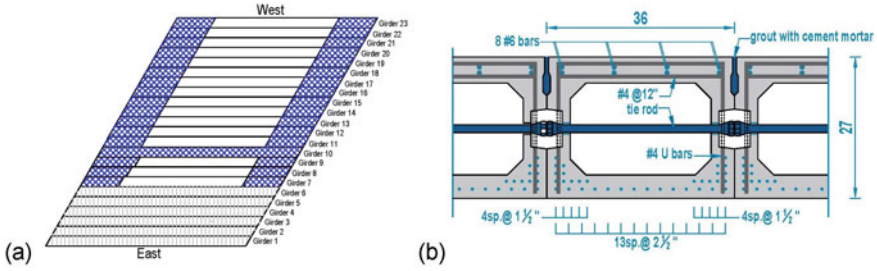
Foulk Road bridge: a plan of repaired girders (hatch pattern indicates fiber direction), b typical cross-section
